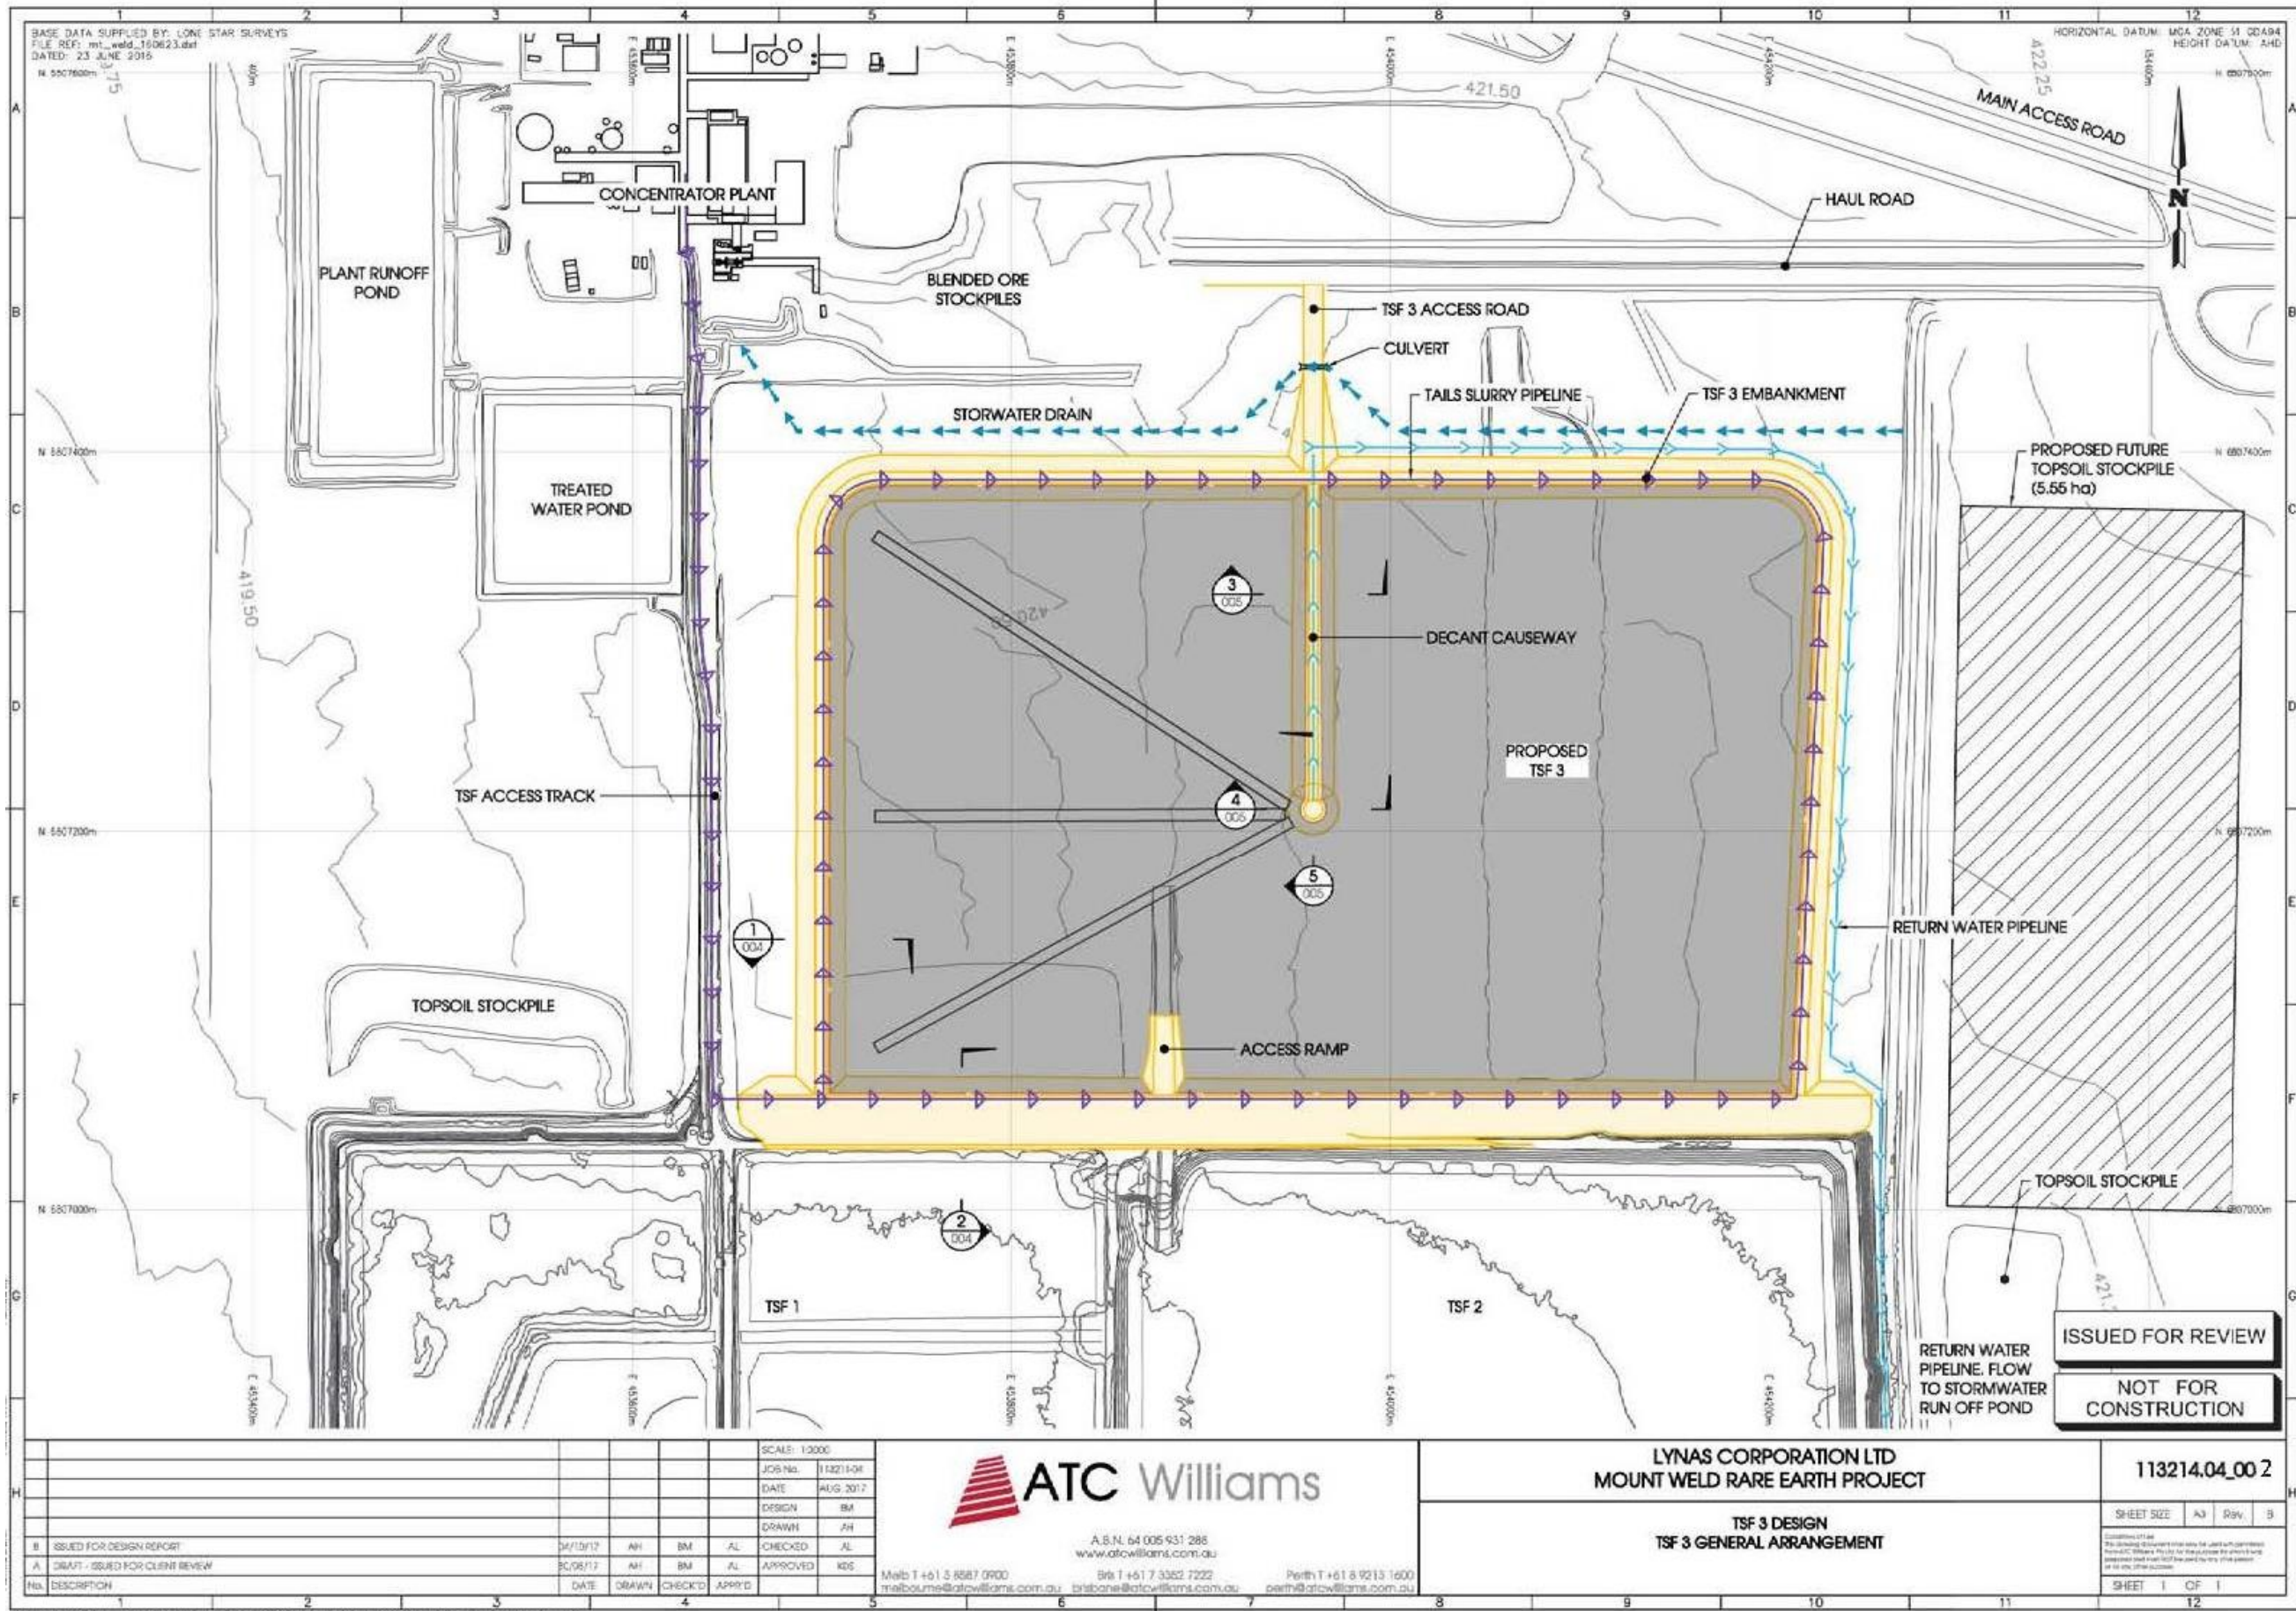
Tailings Storage Facility 3 General Arrangement
